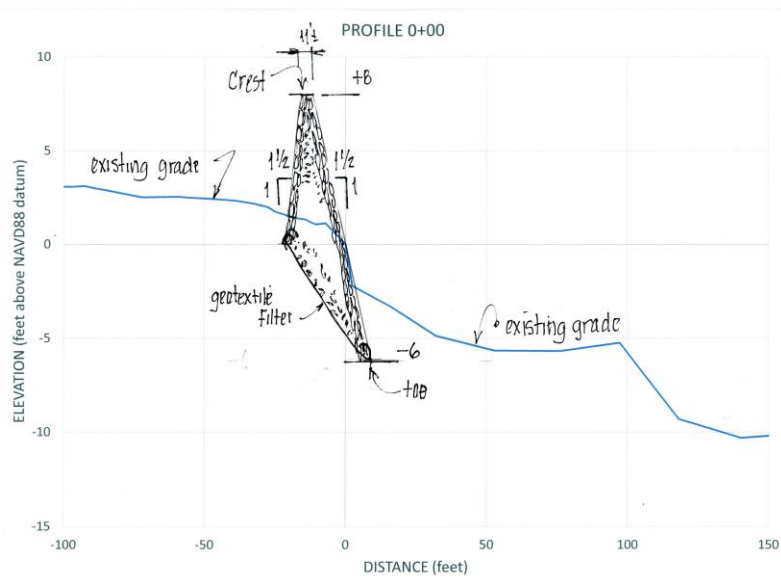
Typical Revetment Cross-Section and Prevailing Profile
